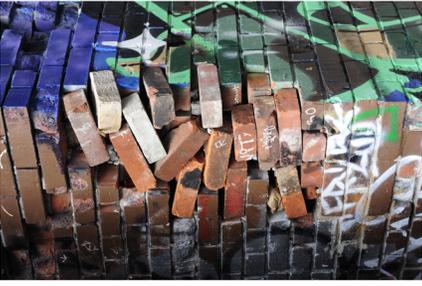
An improvised repair to a brick chimney at 1000 Parker Street
